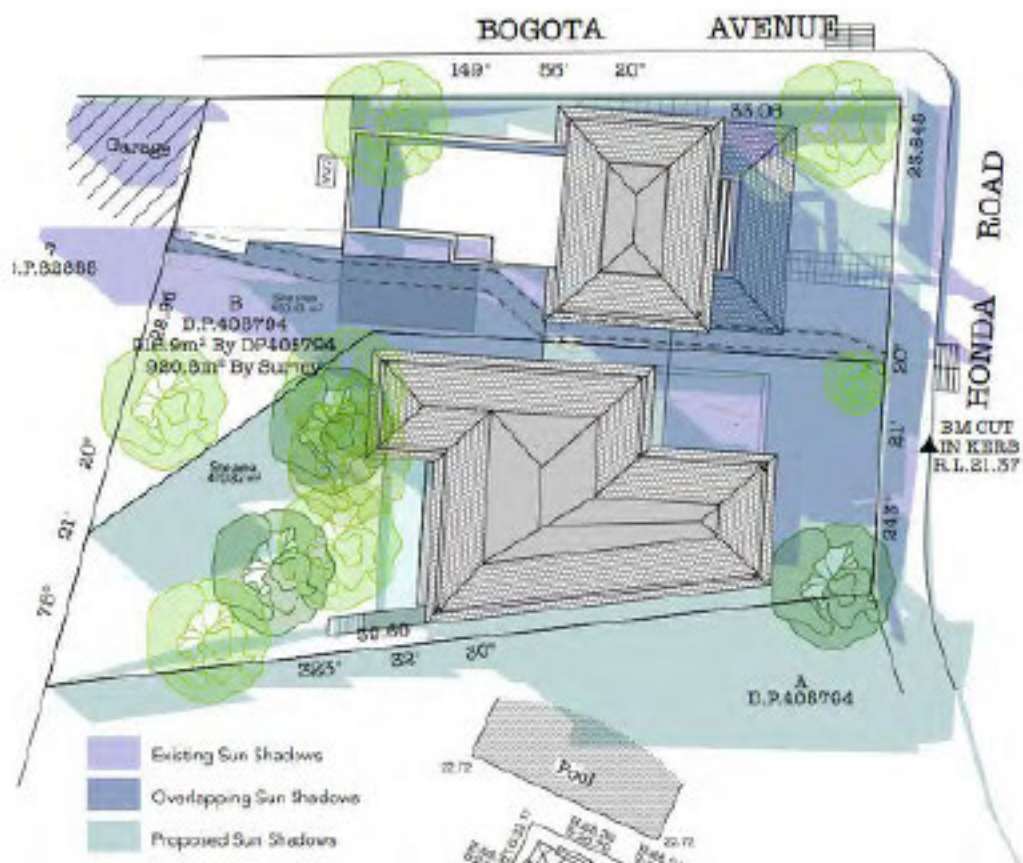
Shadow Diagram at 10.00am in mid-winter (June 21) detailing shadow cast from the Dwelling 1 (subject to alterations and additions) and Dwelling 2 (new dwelling) – DA28 Rev B
